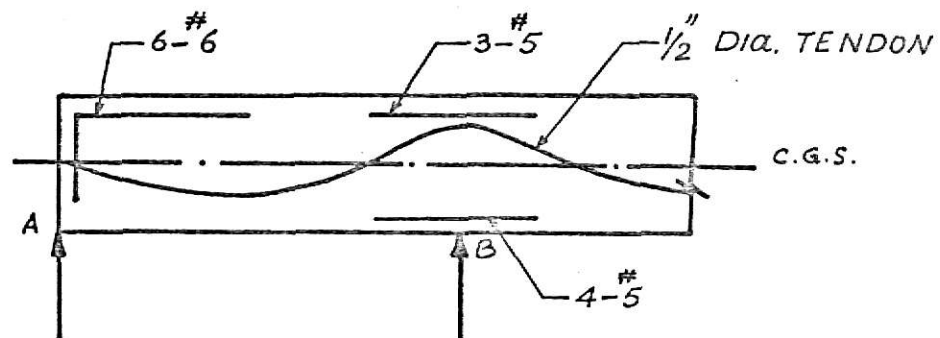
ELEVATION OF COLUMN STRIP WITH DETAILED REINFORCEMENT.
